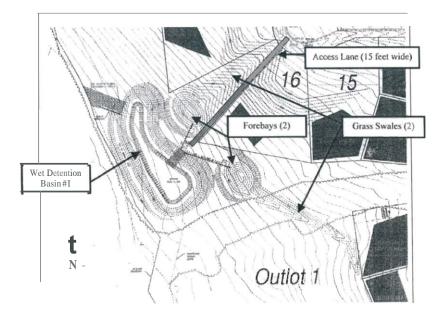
Exhibit C • Stormwater Practice Maintenance Plan (Sample)
